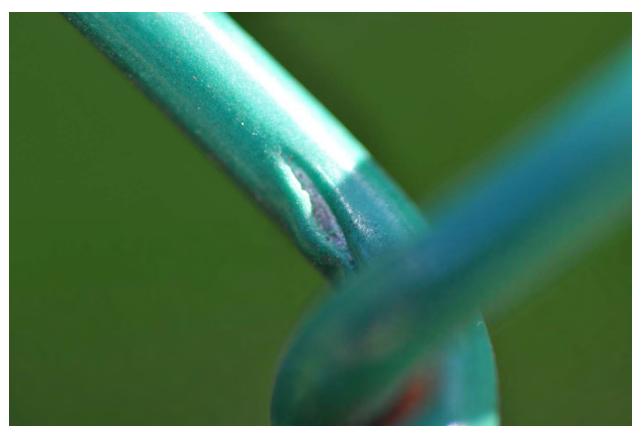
Fuse Bonded PVC Coated Galvanized Wire Fencing
